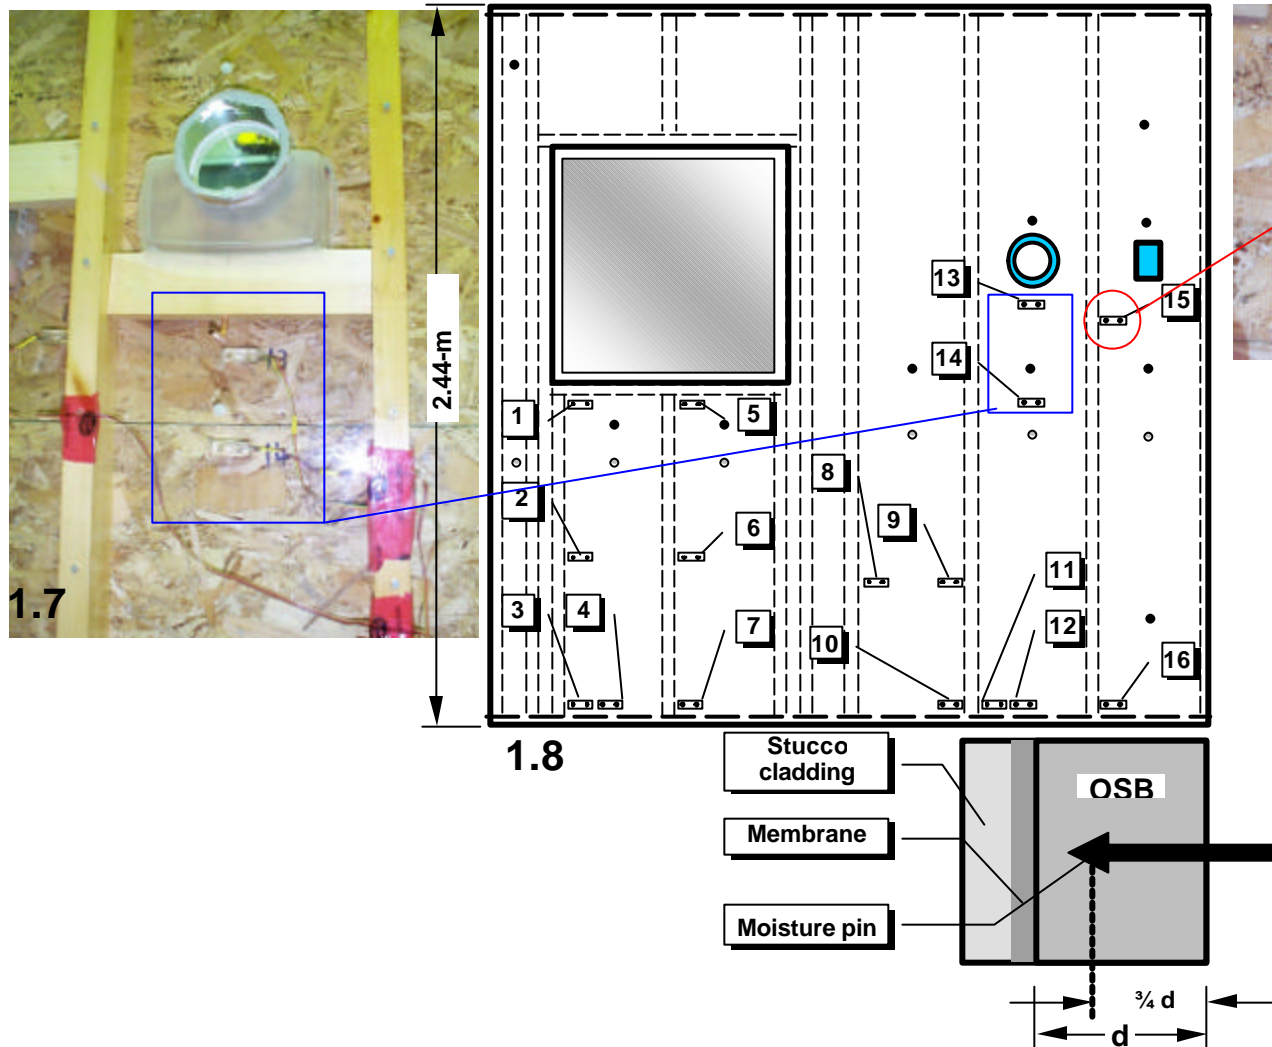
View of moisture sensors in stucco wall specimen (WA-2A)
